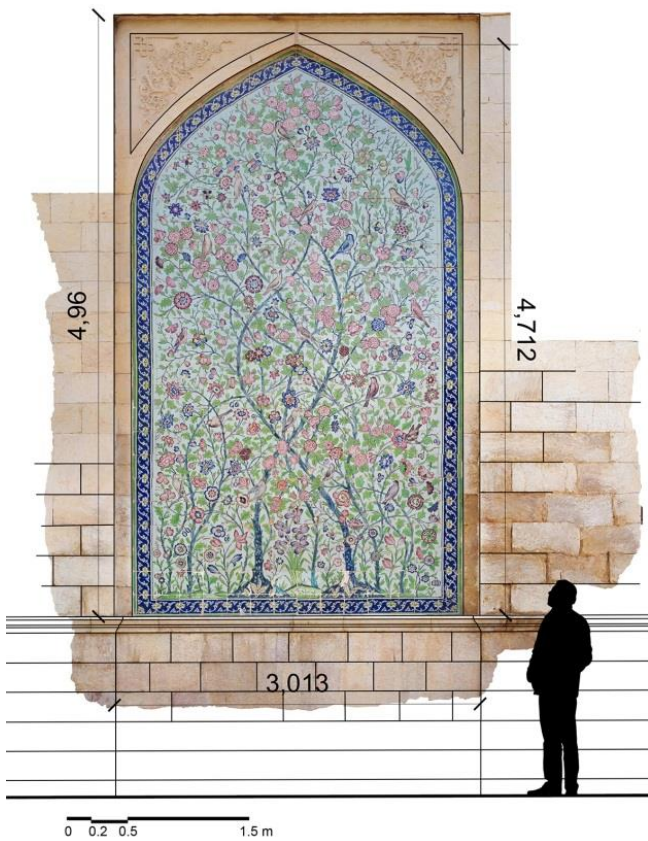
Drawing on the final metric orthoimage of west tilework in AutoCAD
